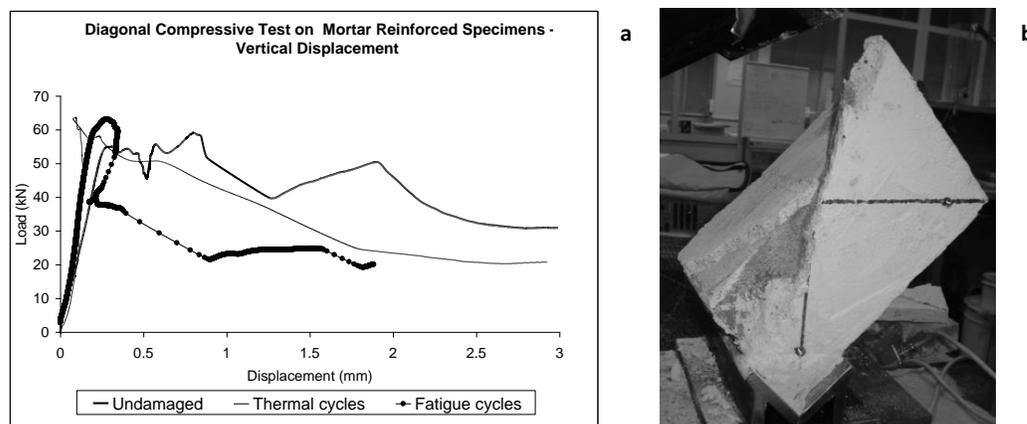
a) Diagonal compressive test on MR specimens after thermal and fatigue damage and in undamaged condition – b) MM02 specimen after collapse.
